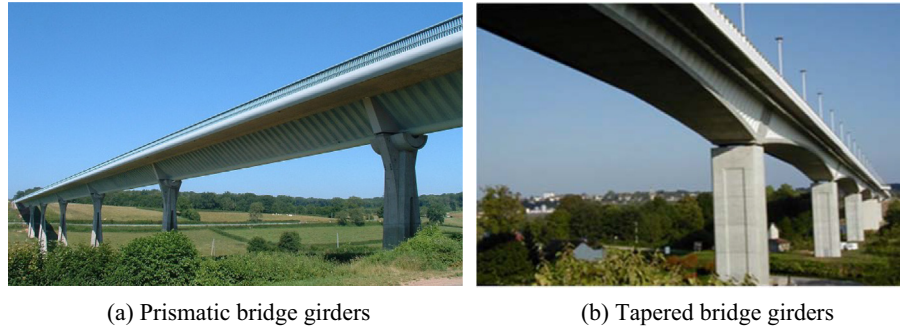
Bridge girders with corrugated webs: (a) Maupré Bridge and (b) Dole Bridge.
